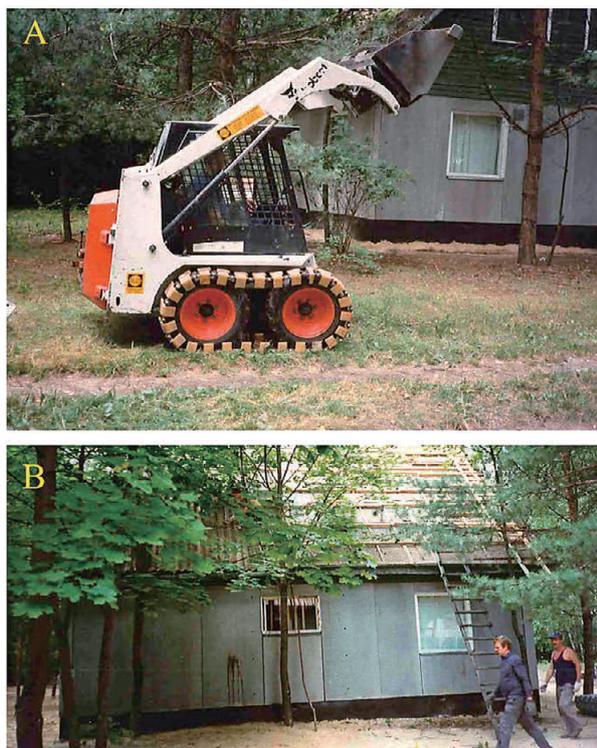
“Bobcat” minibulldozer is ready to start top-soil removal around house No. 1 in Muravinka (A). Roof replacement on house No. 1 in Muravinka after top-soil removal and application of clean sand (B).
